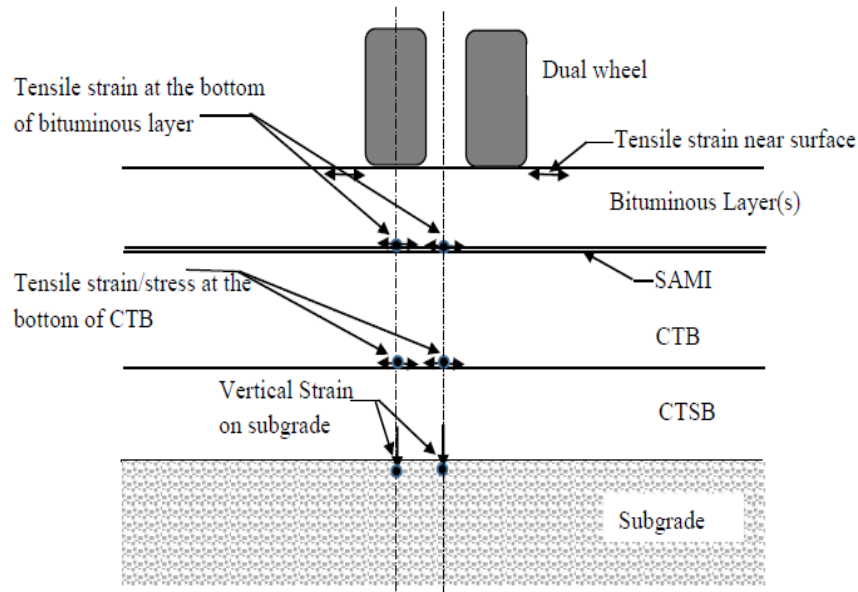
A Pavement section with bituminous layer(s), SAMI crack relief layer, CTB and CTSB showing the locations of critical strains. (IRC: 37-2018)
